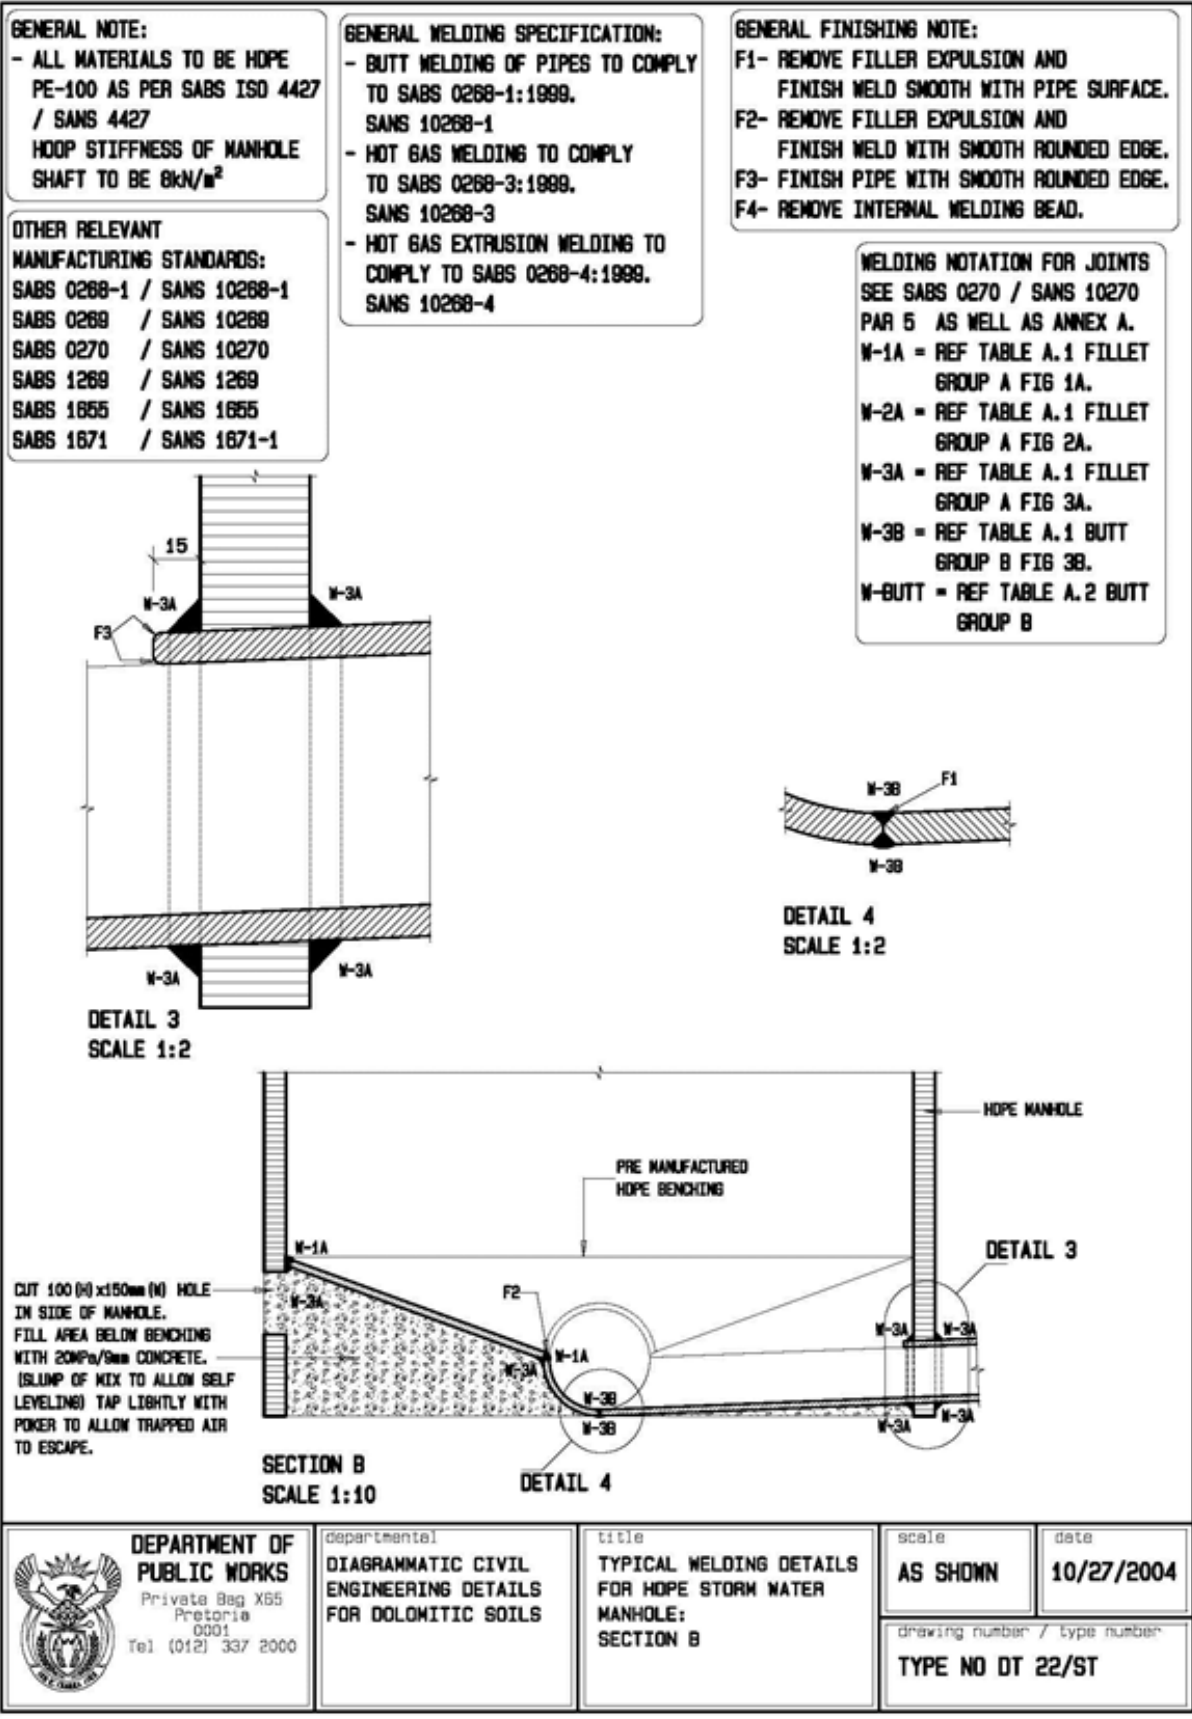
Typical Welding Detail for HDPE Pipes in Stormwater Manhole
